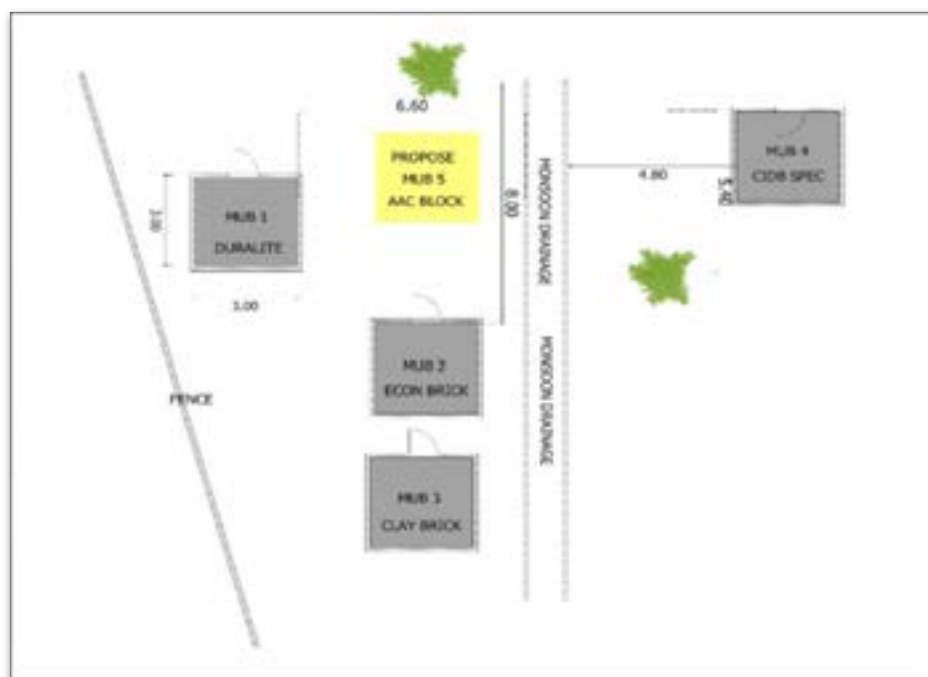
Layout Plan Triple Green Mock-Up Building Park Kuala Lumpur
